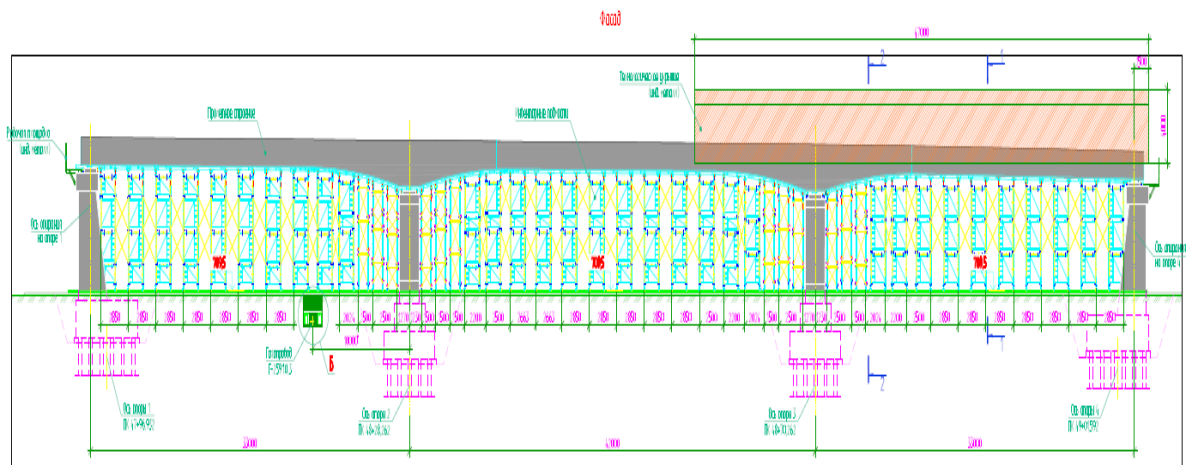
Installation of scaffolds and formwork for concreting the span structure Span1
